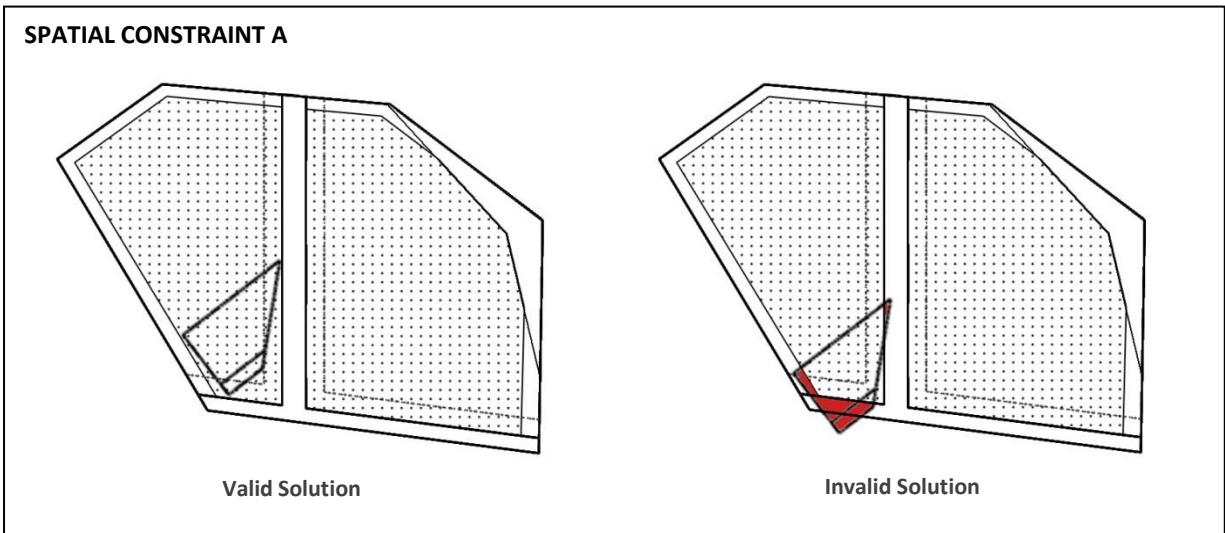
Spatial Constraint A: Building Containment in Constructible Site
